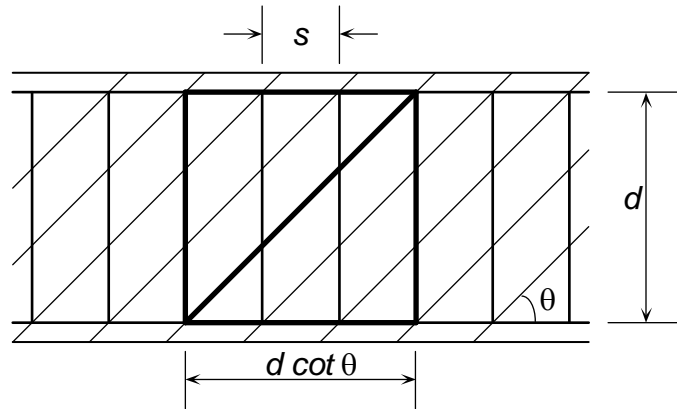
Idealization of Crack inclination for an Analogous Truss (adapted from 5-7)
